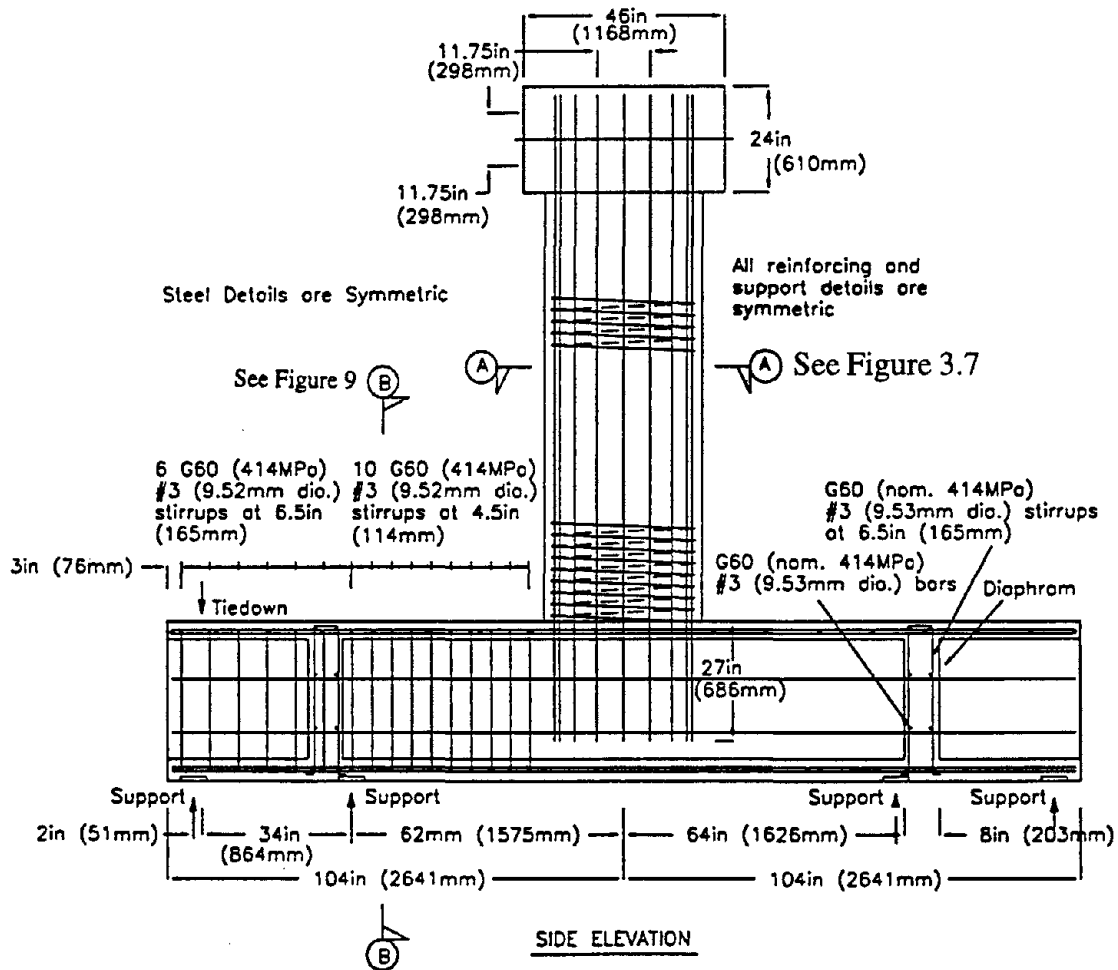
Side elevation and reinforcement details of as-built unit SM3.
